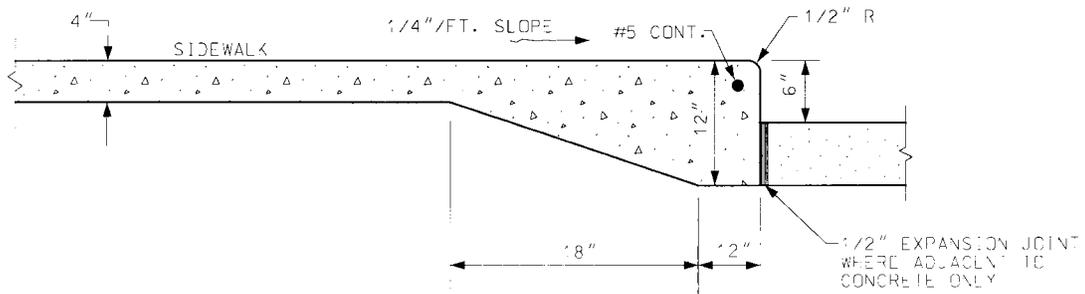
Concrete curb and sidewalk combination should be used when storm water flow is desired to flow away from curb.
